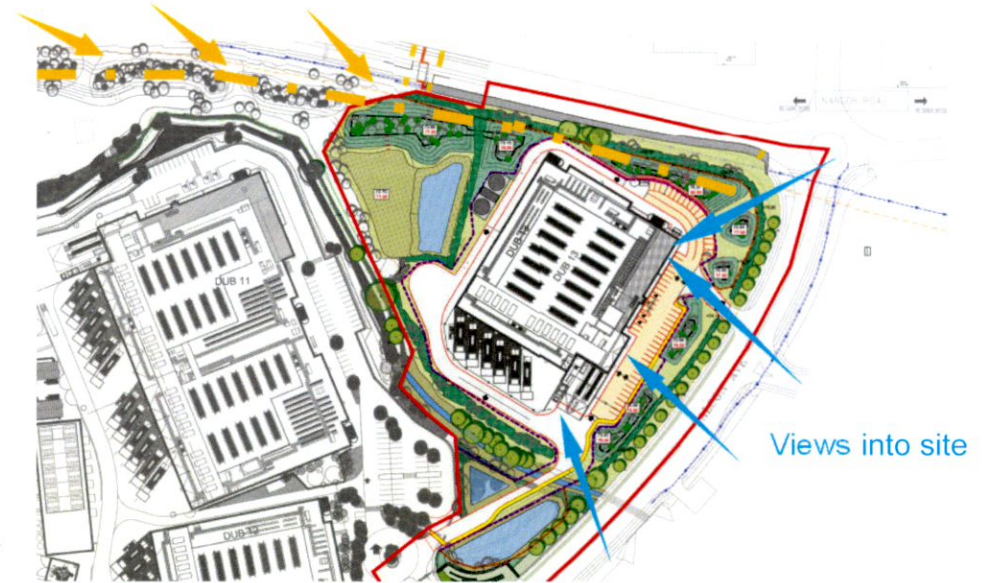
Site Plan showing the Landscape Screening and Views into the Site (Modified as per additional information)
